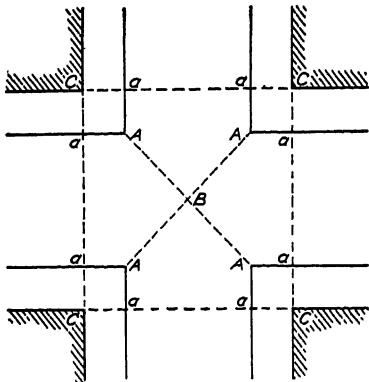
Diagram Showing Arrangement of Grades at Street Intersections
